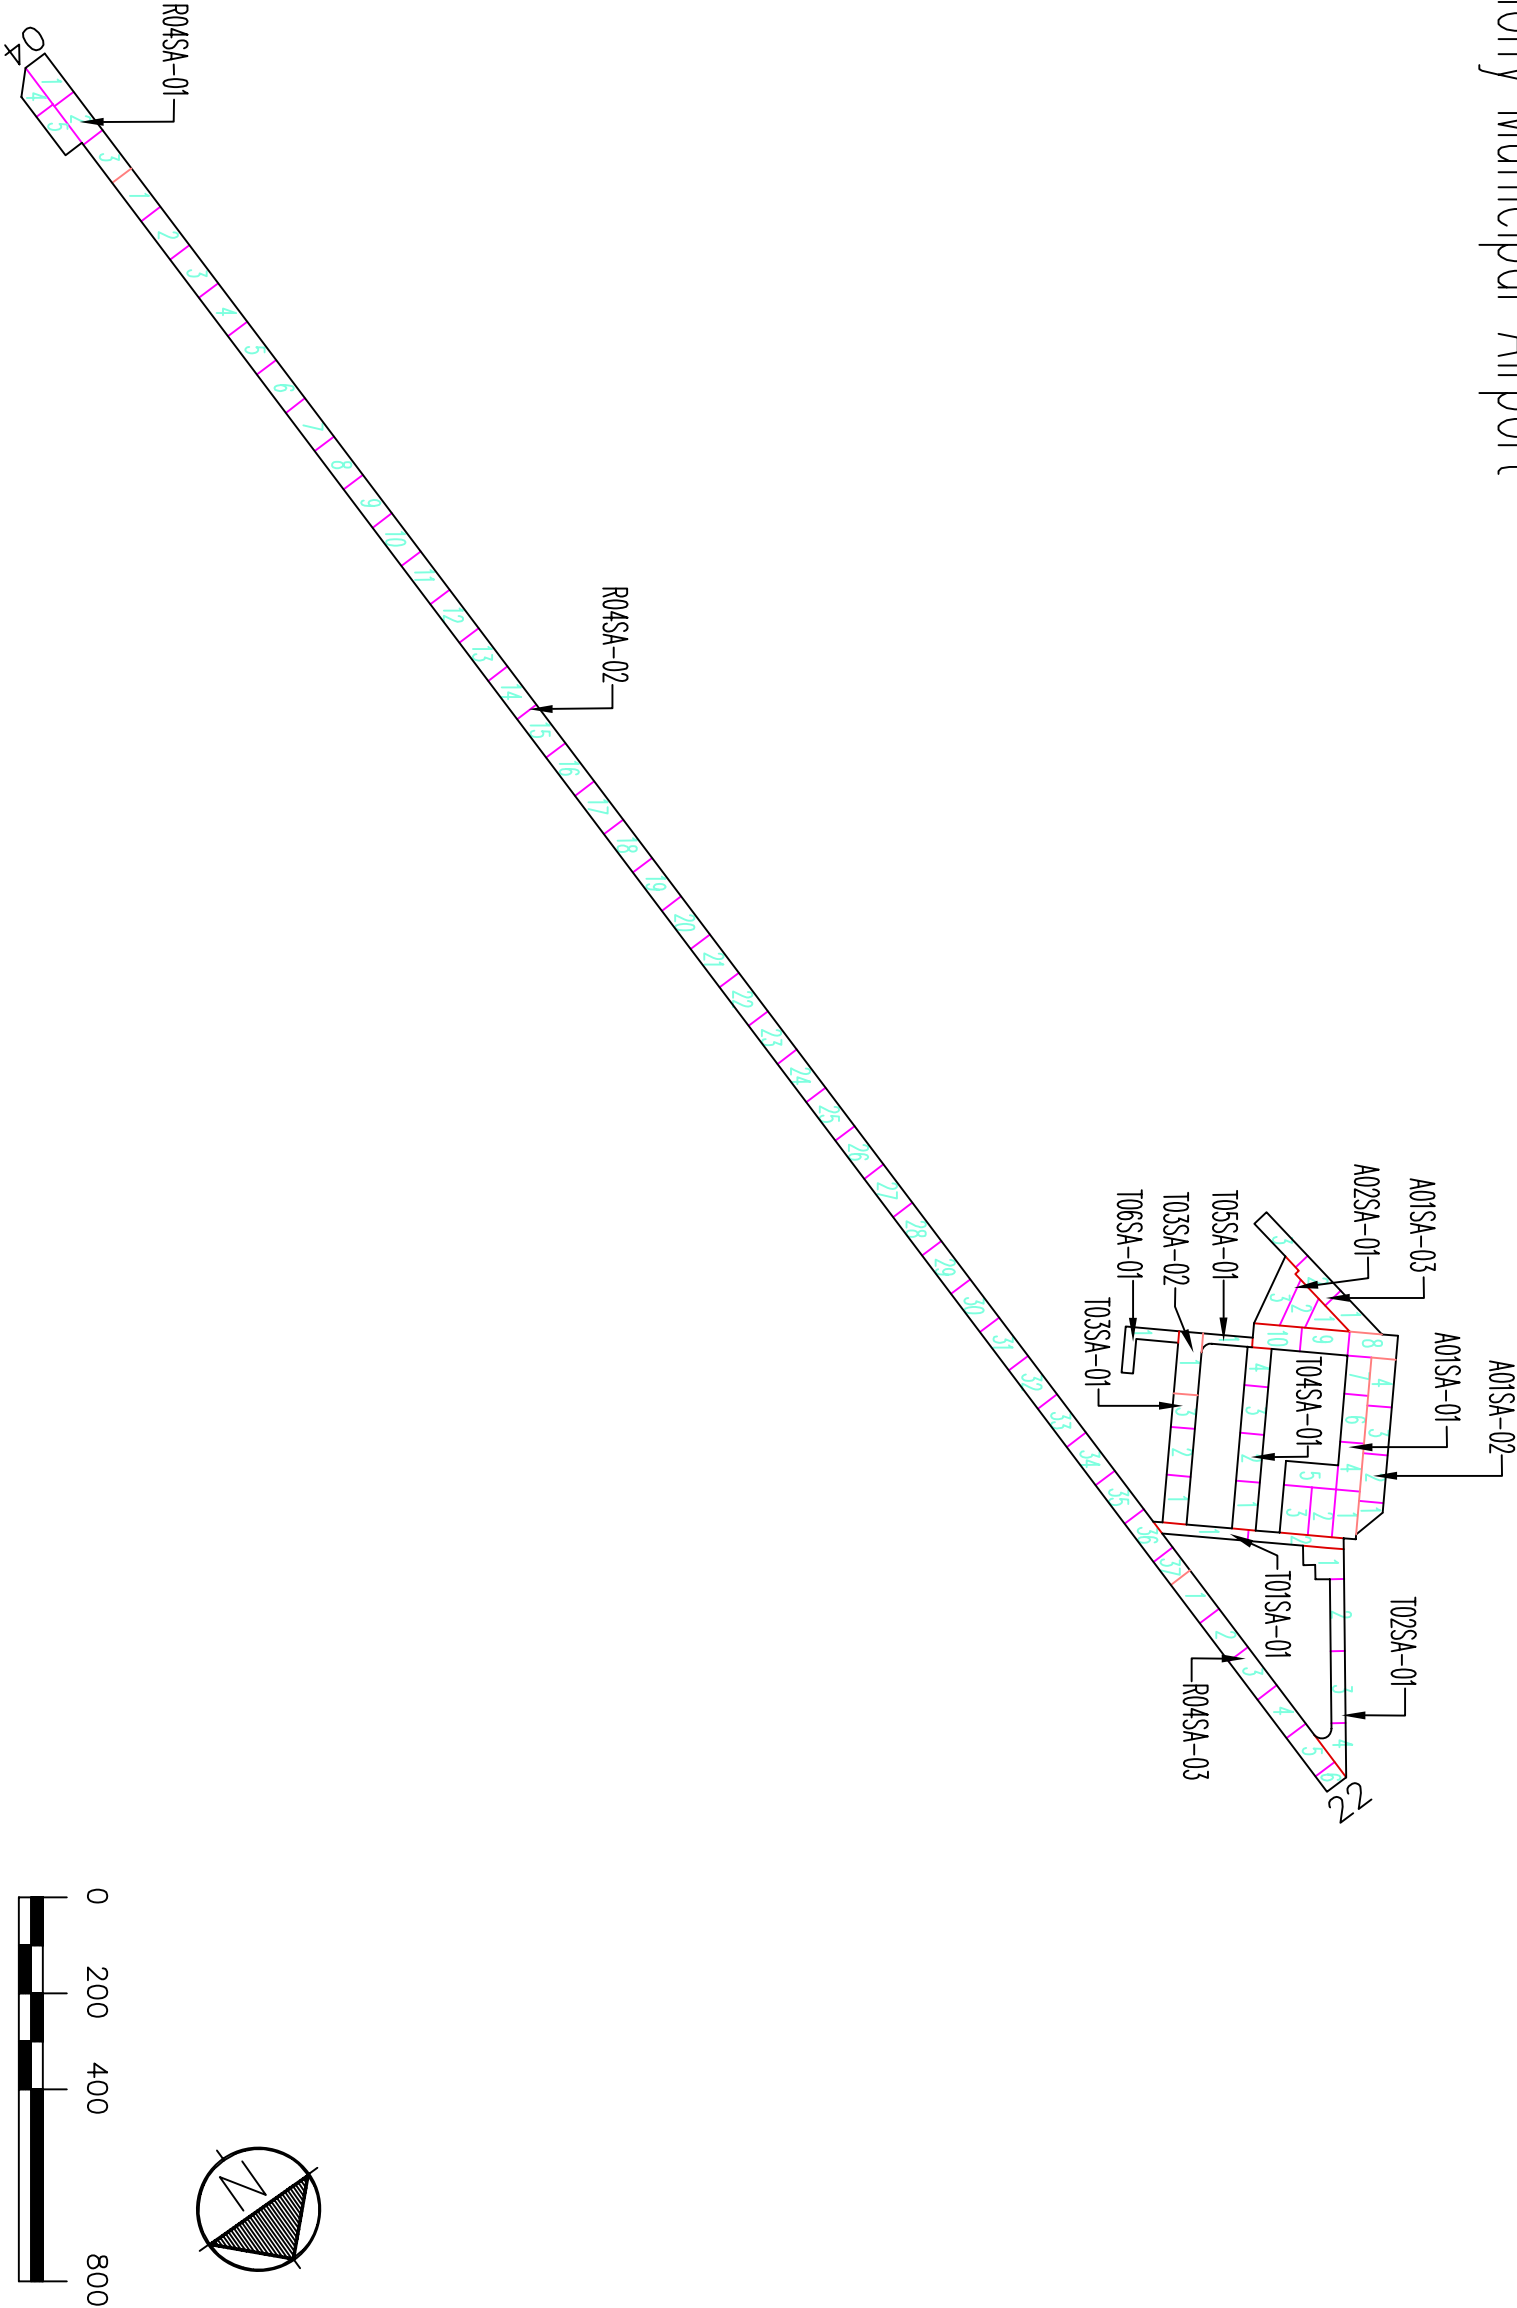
Pavement Branch, Section and Sample Unit Layout.
